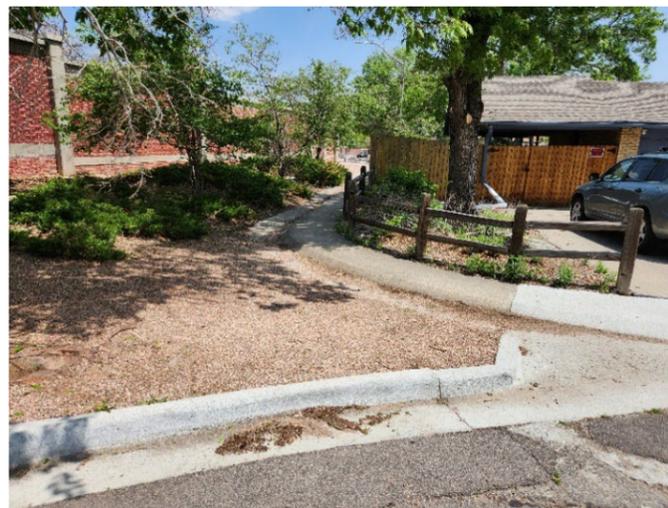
Dead end to sidewalk at the corner of Ingalls Street and 72nd Avenue Frontage Road
